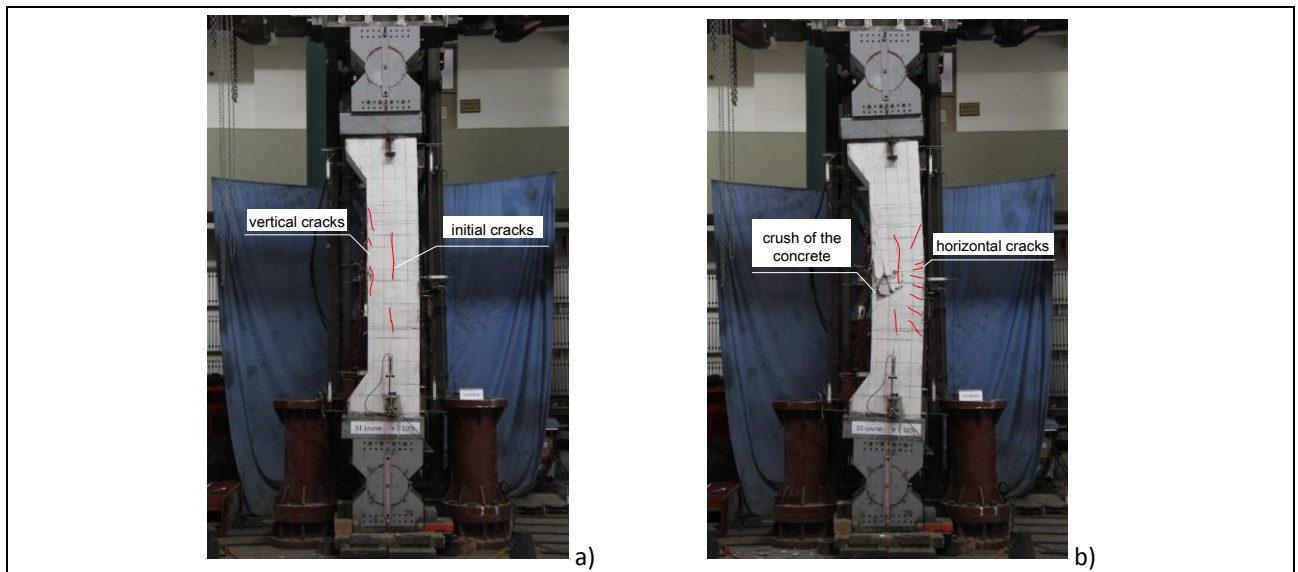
Crack development of specimens subjected to eccentric loads: a) 70% of the maximum load; b) failure load.
